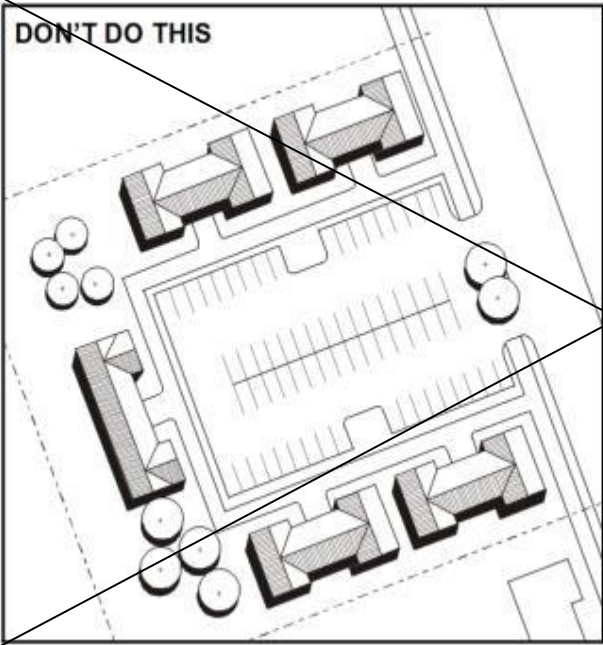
(D): Avoid parking that dominates the site. Encourage parking located behind or on the side of buildings and common open space between buildings.
